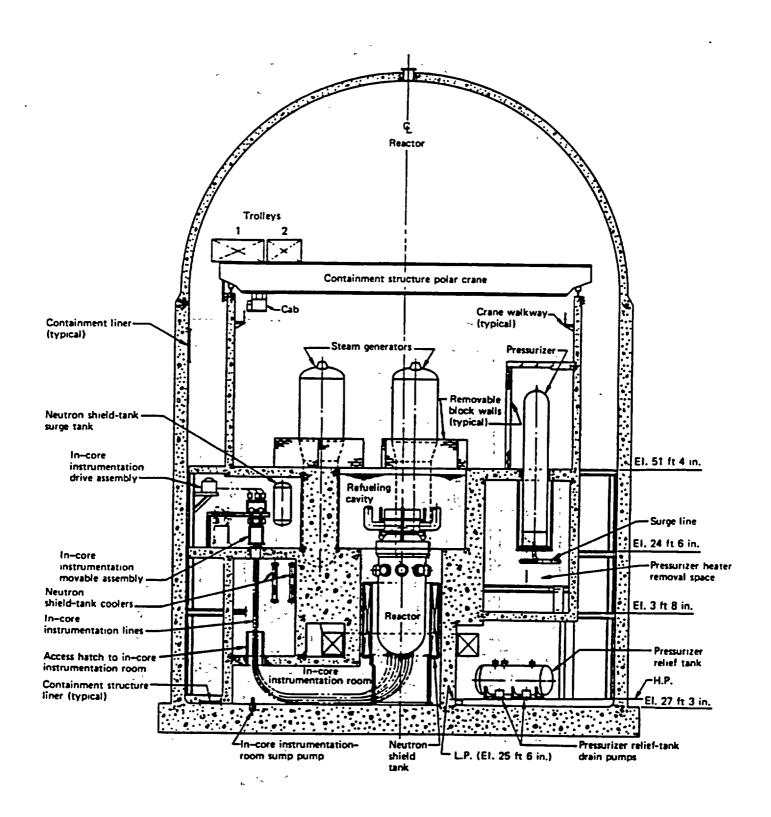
Millstone 3 Subatmospheric Containment (Reinforced Concrete with Steel Liner)
